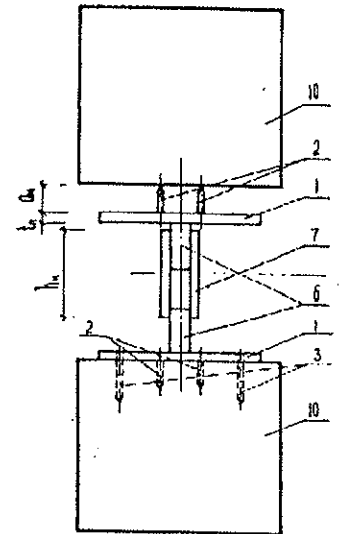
Side view of assembled beam with chords separated by connector provided with threaded coupling to facilitate adjusting of beam height.
